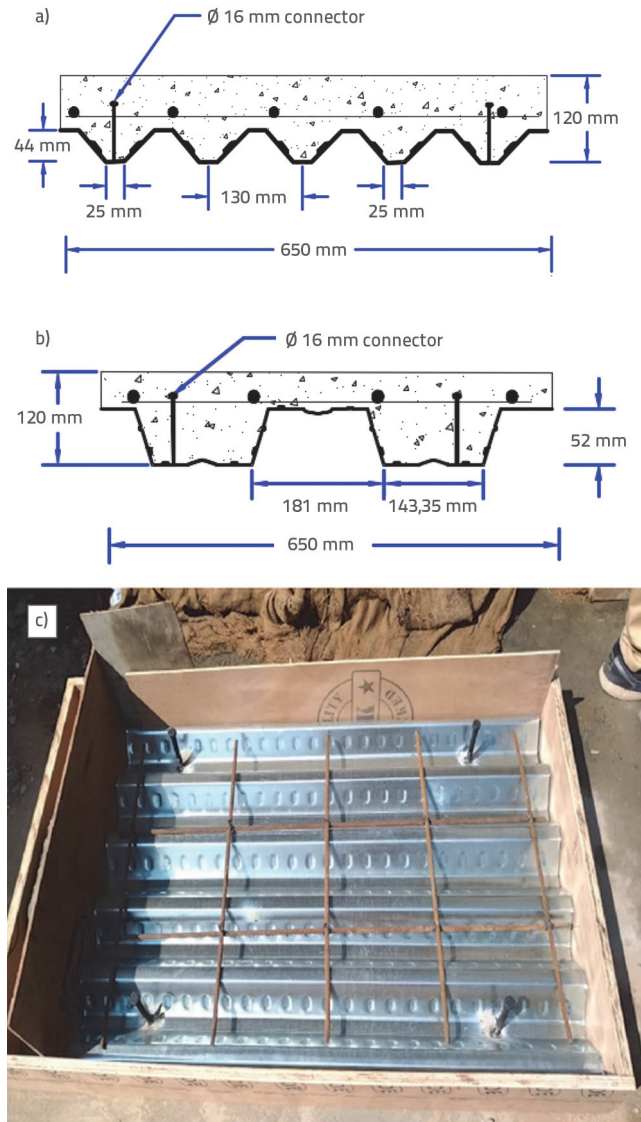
Sectional specifications of: a) D44 profiled deck sheet; b) D52 profiled deck sheet; c) showing the cast specimens
